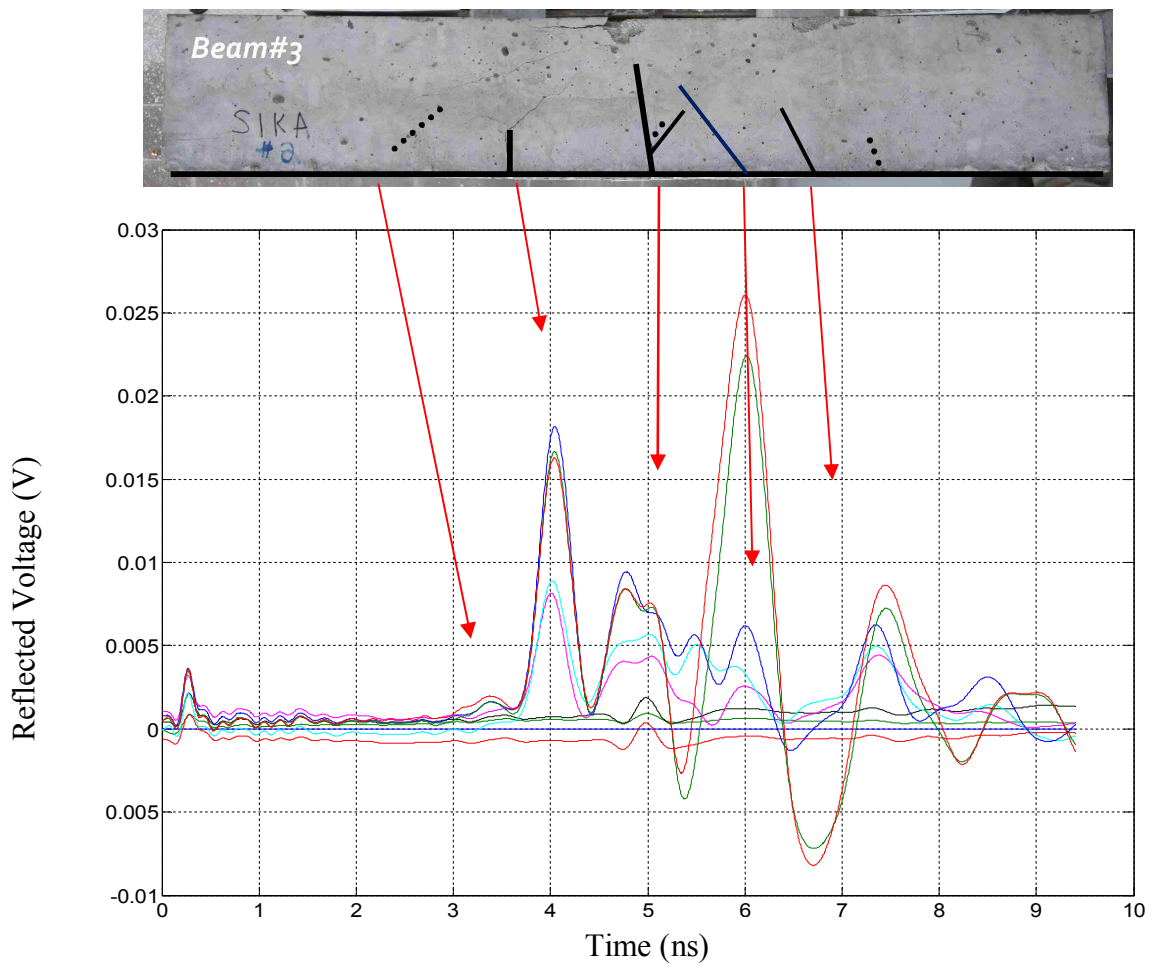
Crack pattern of Beam # 3 and TDR signatures from Sensor # 1: embedded with SikaGrout 212
